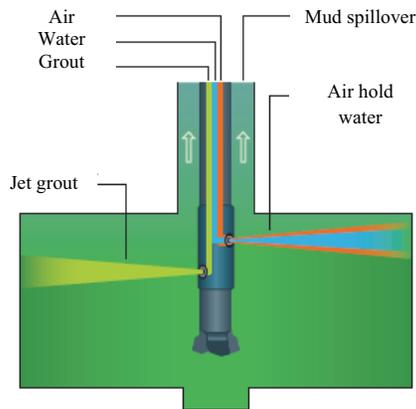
Triple pipe method of high-pressure jet grouting pile (T-construction method)
